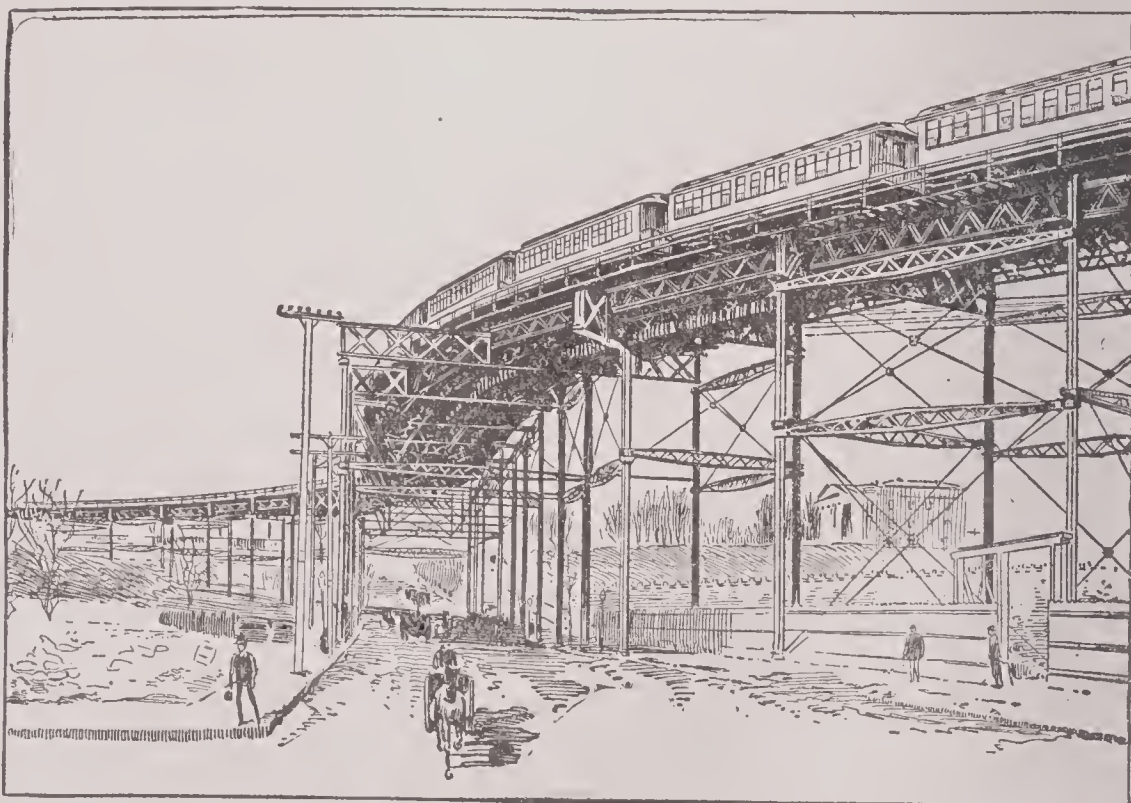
A NEW YORK ELEVATED RAILWAY.
